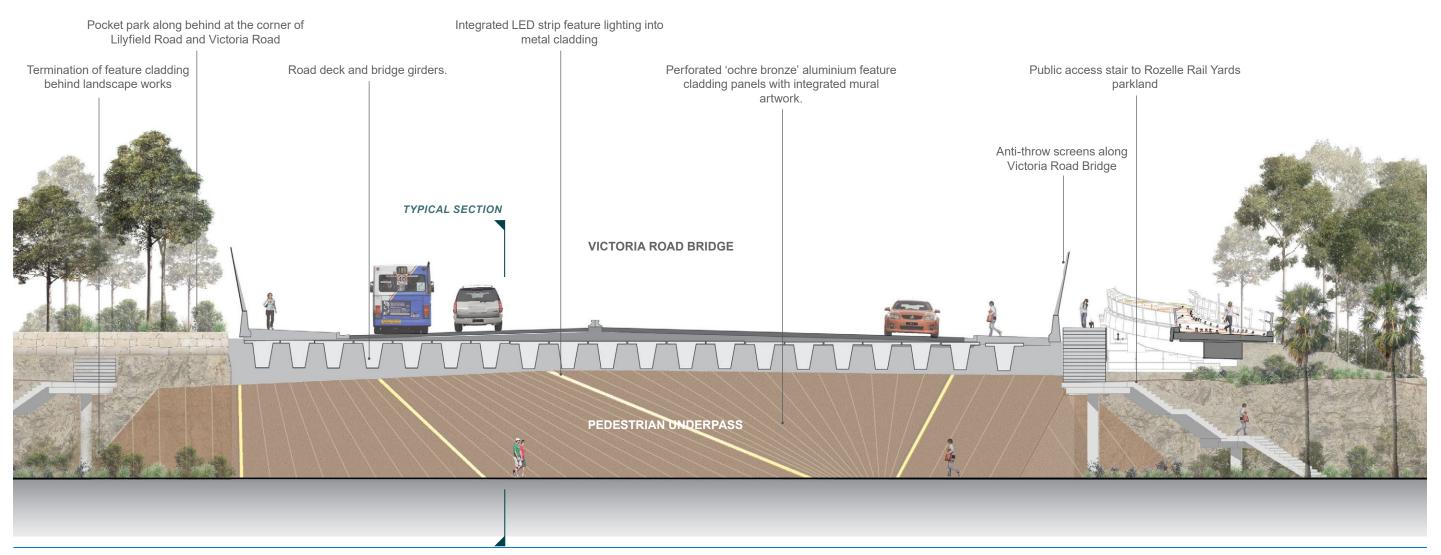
Section 3 - Bridge over Rozelle Rail Yards. Section
